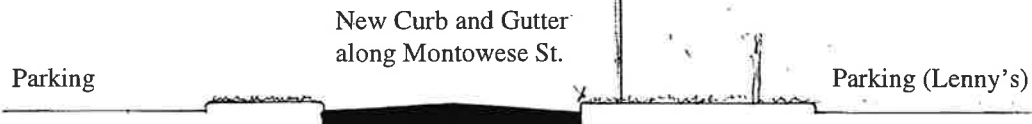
Concept plan illustrates the use of shared driveways and curb control to reduce turning movements to and from Montowese Street.
